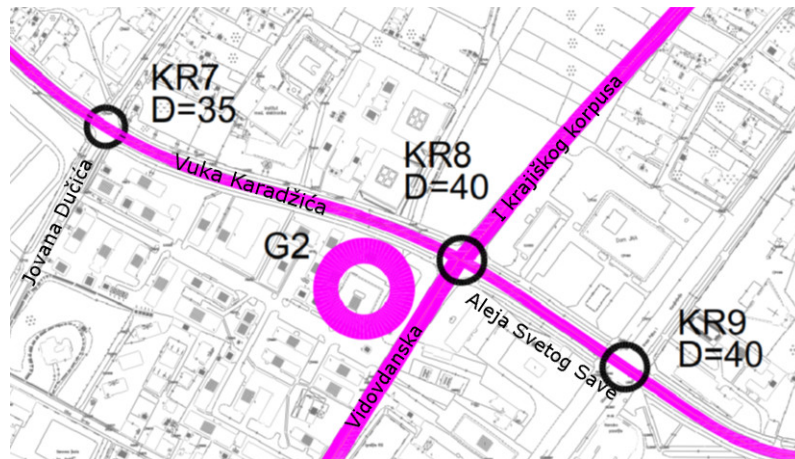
Proposal for reconstruction of intersections along the street Vuka Karadžića in order to support access to the site of the garage G2 [authors]
